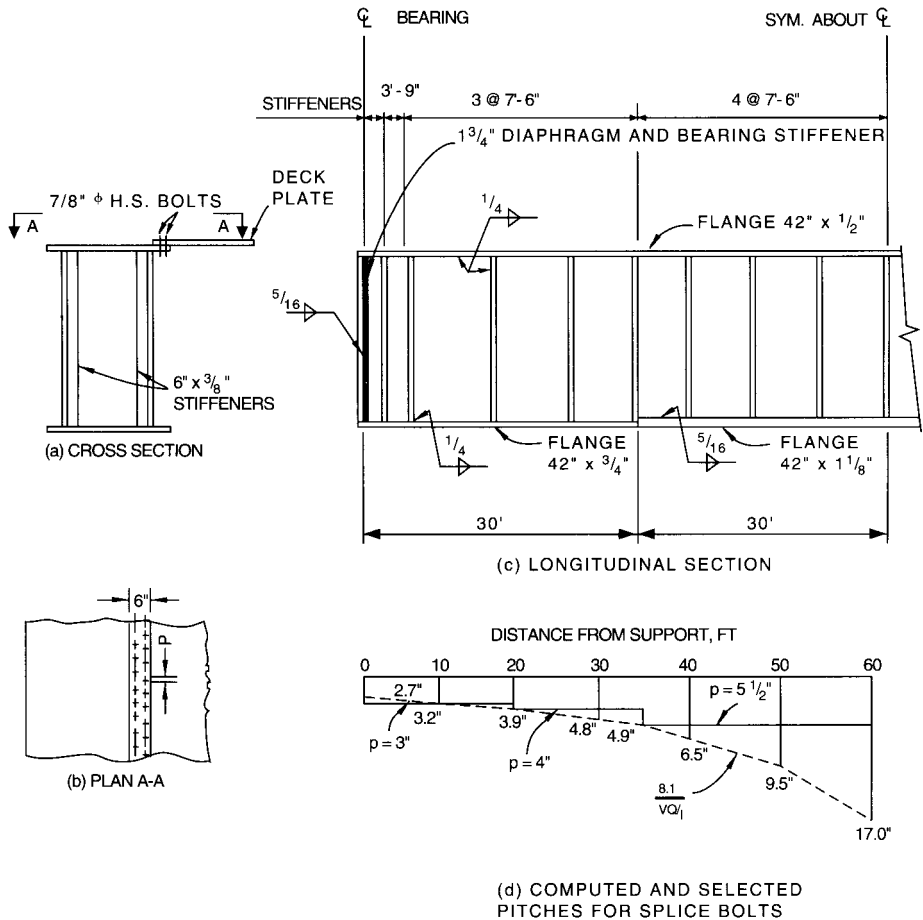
Details of box girder with orthotropic-plate top flange.
